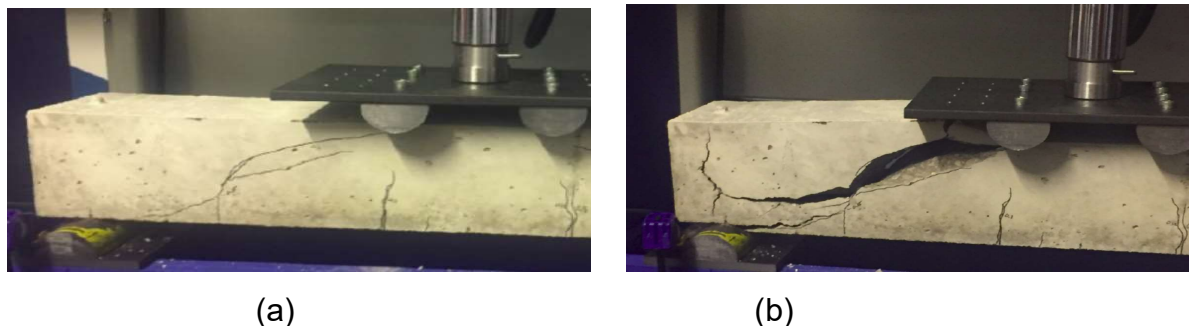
Failure patterns in a beam without stirrups with longitudinal 3-10M bars at the onset of shear cracking (a) and at failure (b). Note the manifestation of anchorage failure preceding the brittle failure of the beam, despite the  $a/d$  ratio exceeding the limit of 2.
